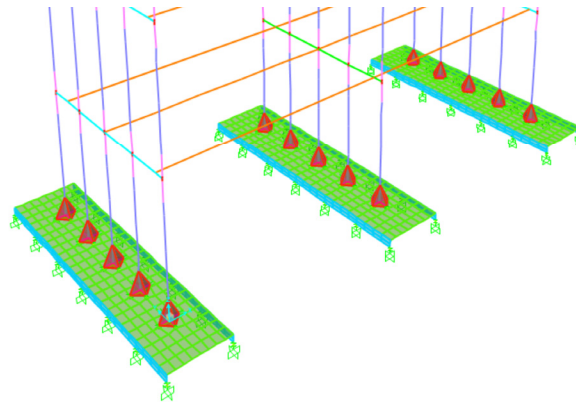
Friction dampers were introduced at anchor locations attaching bottom channels to foundation.
